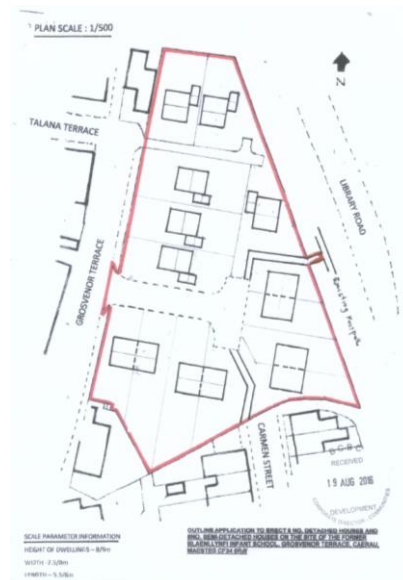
Outline Indicative Layout Plan approved under P/16/88/OUT
